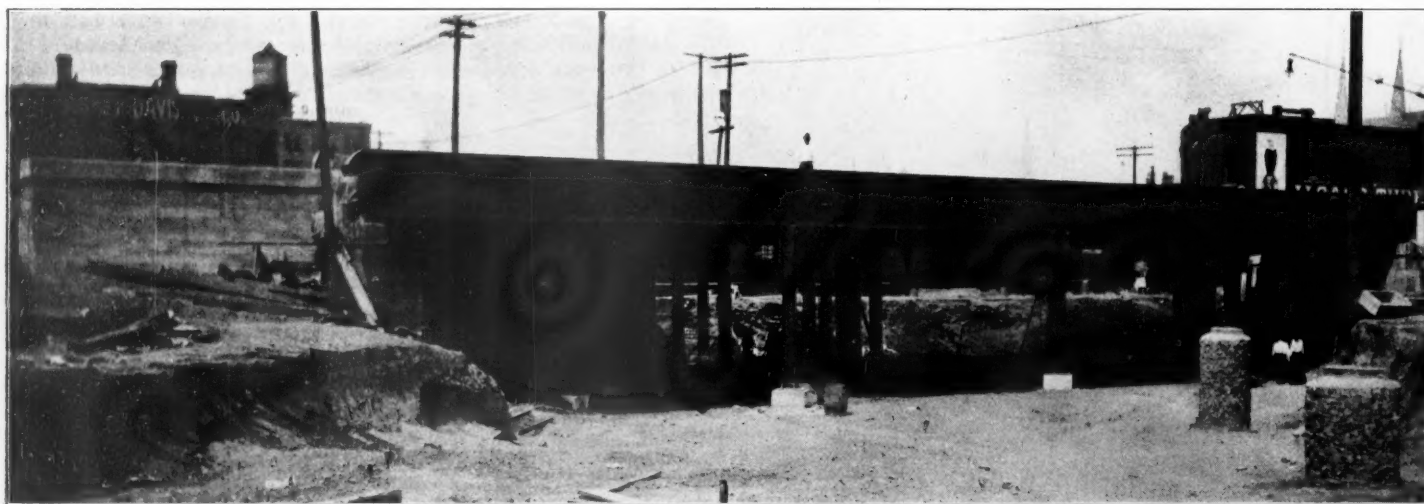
Kentucky Avenue Bridge; Indianapolis Track Elevation.
